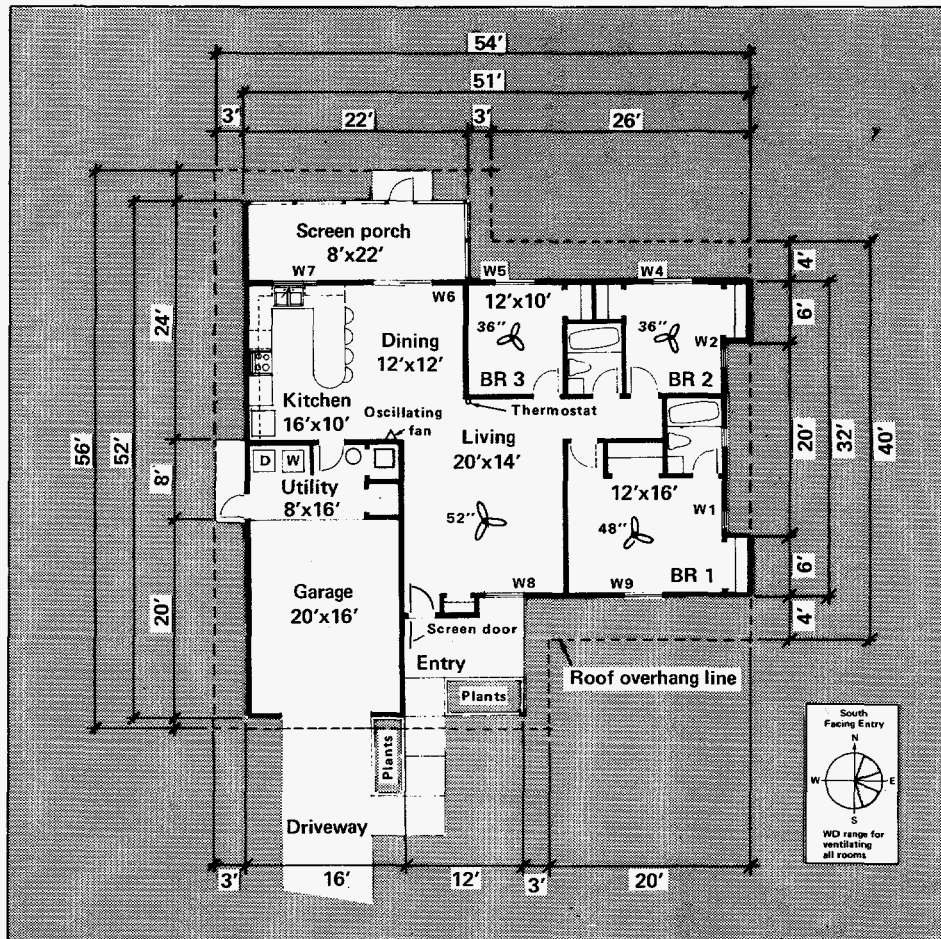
shows the floor plan for a south-facing lot. Solar gain from the west is minimized by not using windows. The garage east wall acts as a wingwall to deflect southeast winds into the house; the solid west wall of the screened porch serves a similar function for northeast wind. Closets in BR1 and BR2 are designed to act as wingwalls also. The wingwall in BR1 creates a negative pressure on window 1 (W1) and makes it an exhaust, and the wingwall next to W2 makes it an inlet. BR3 cannot be directly cross ventilated; the door must be left open to cross ventilate.
